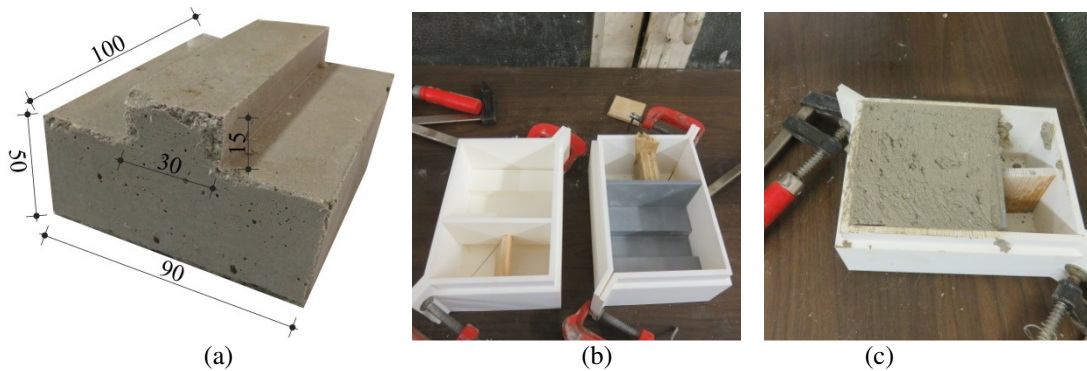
(a) Designed specimen; (b) printed moulds; (c) curing phase
